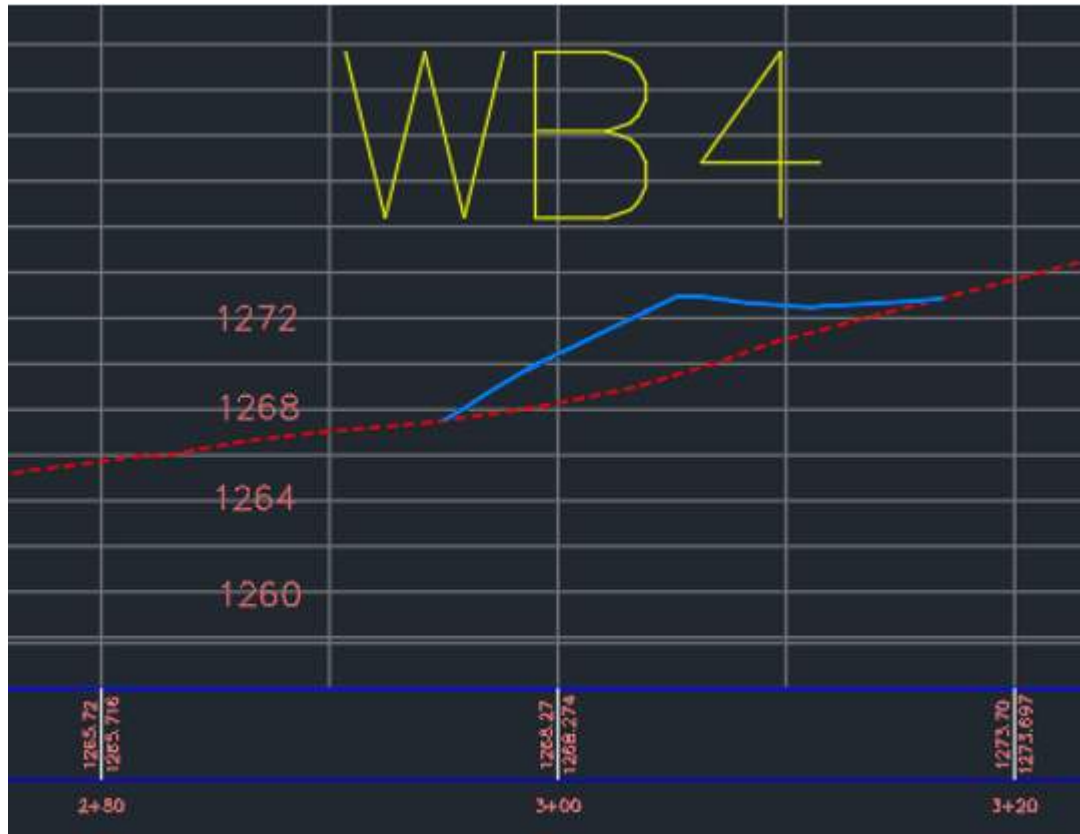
Location 4 Profile View of Existing and Proposed Ground Elevation
